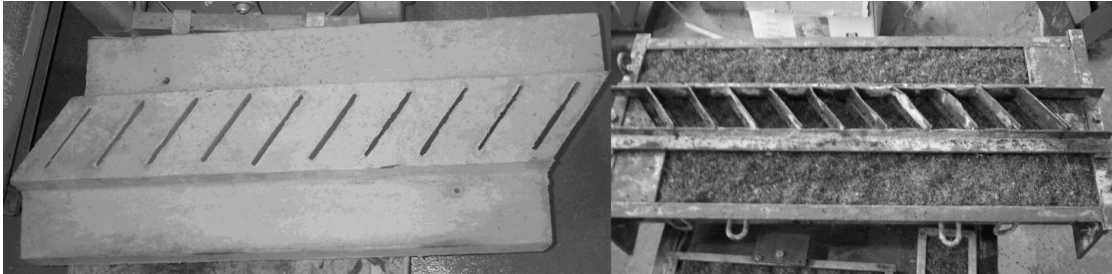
Precast cover slab for drainage channels (Pilakoutas *et al.* 2004)
